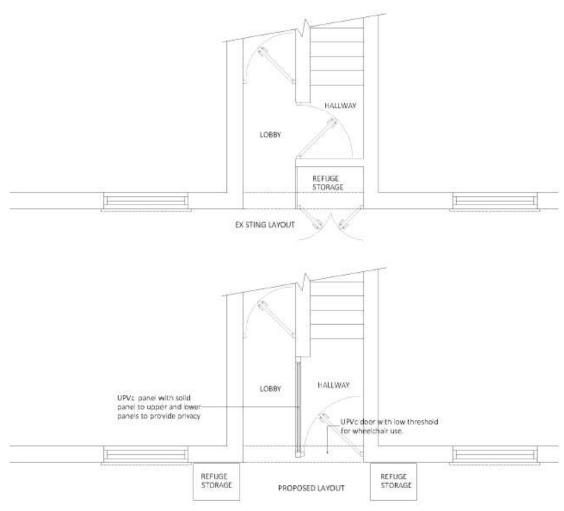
Proposed Floorplan (please note – larger version of plan can be found in the Committee Plan Pack)
